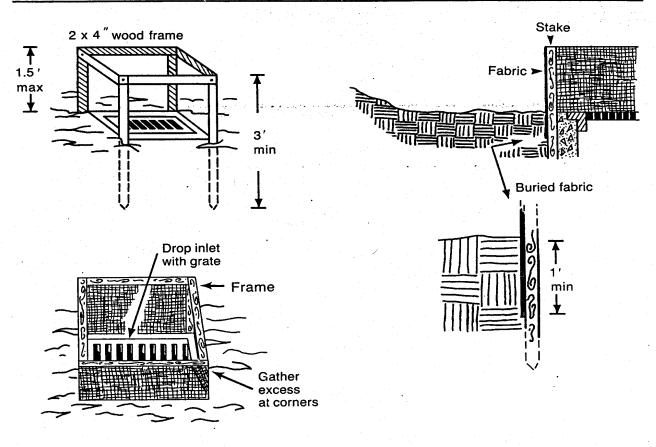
Installation of fabric and supporting frame for inlet protection.
